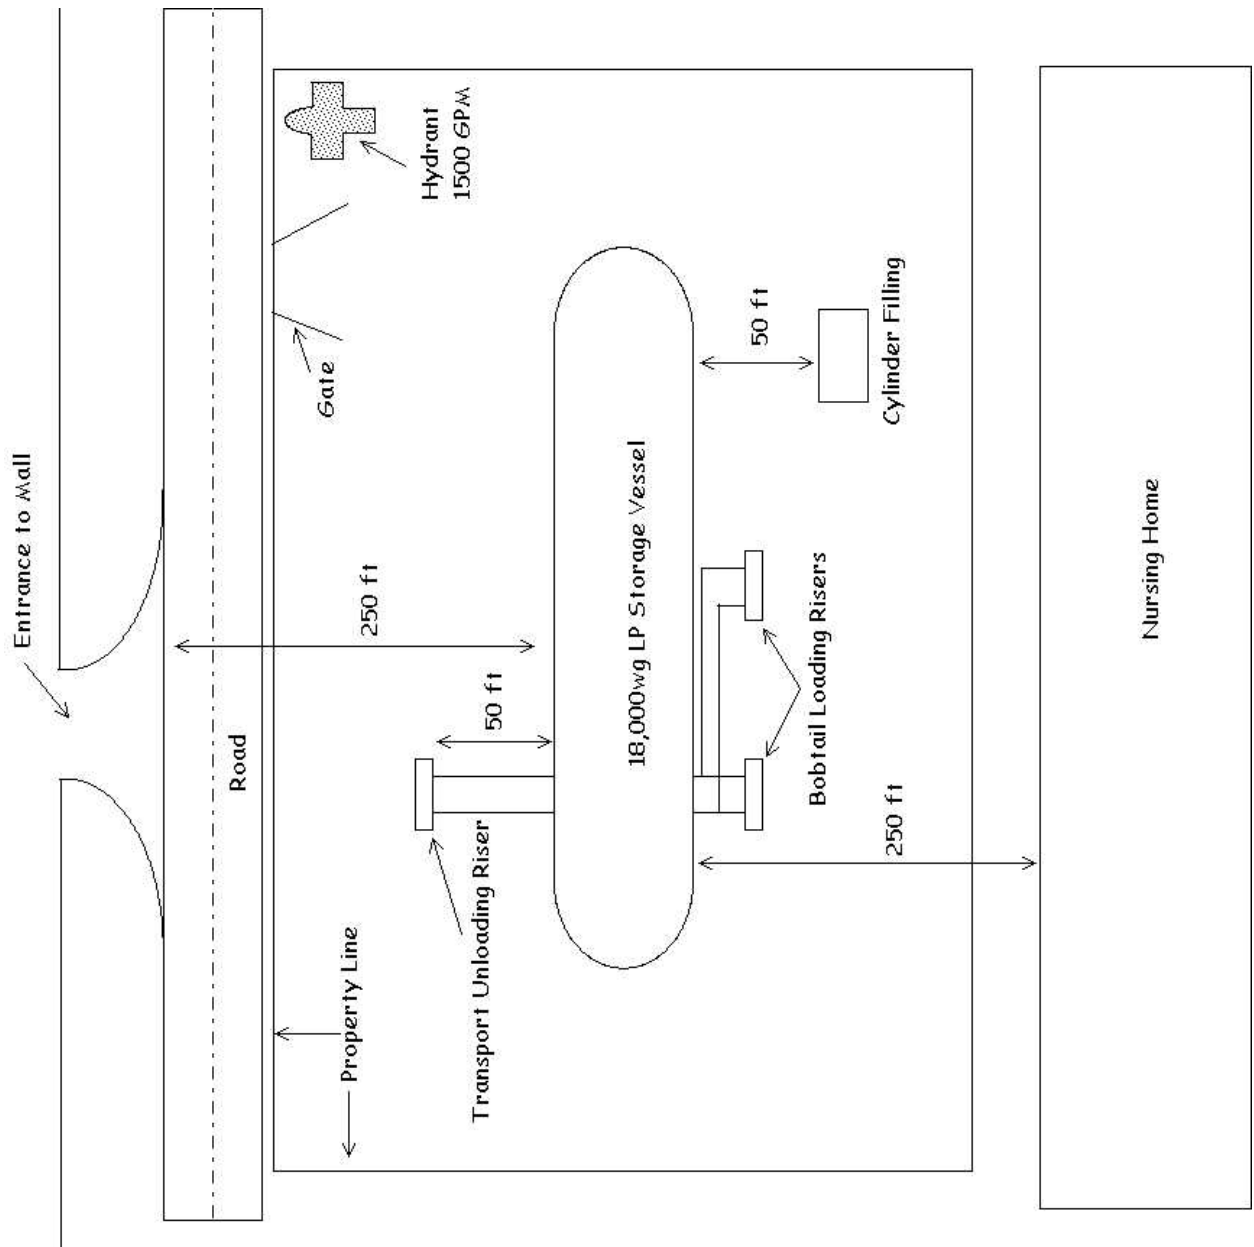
Schematic plan view of a LP-Gas facility used in Example 3
